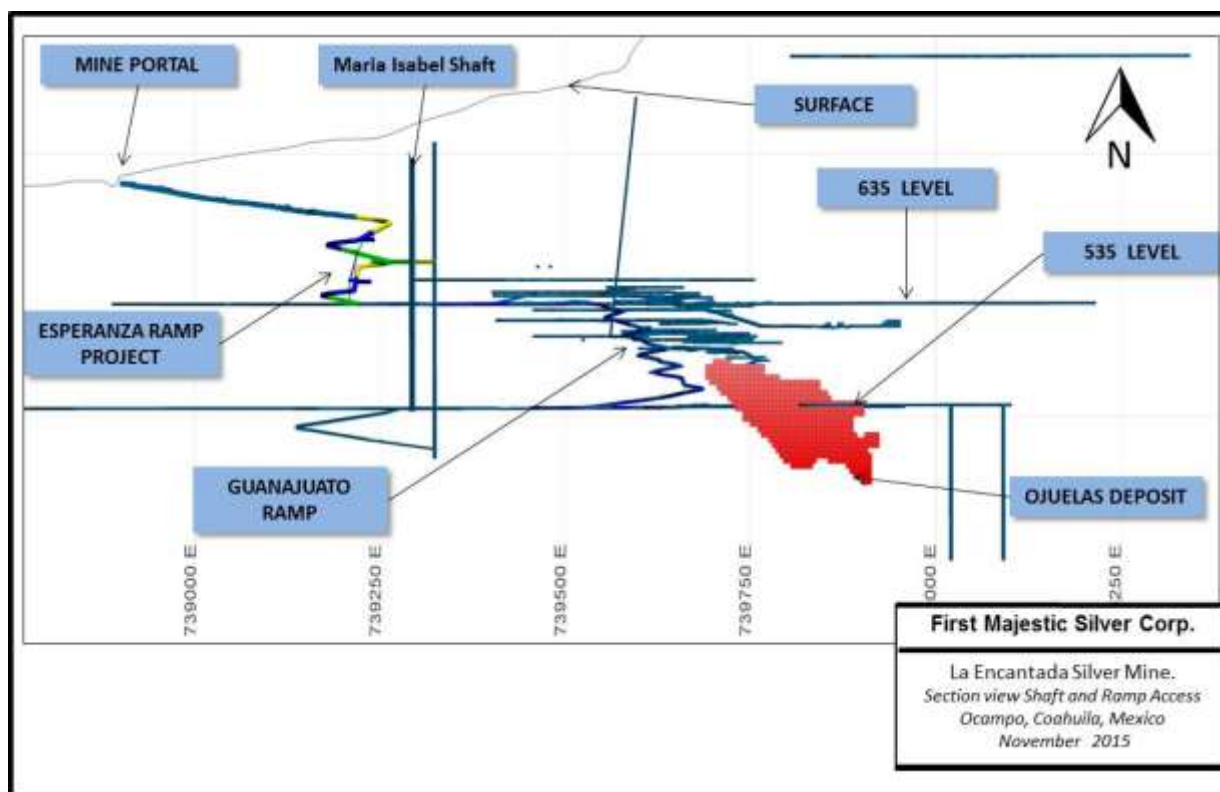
Section view showing the main ramp and shaft to access the La Encantada workings
